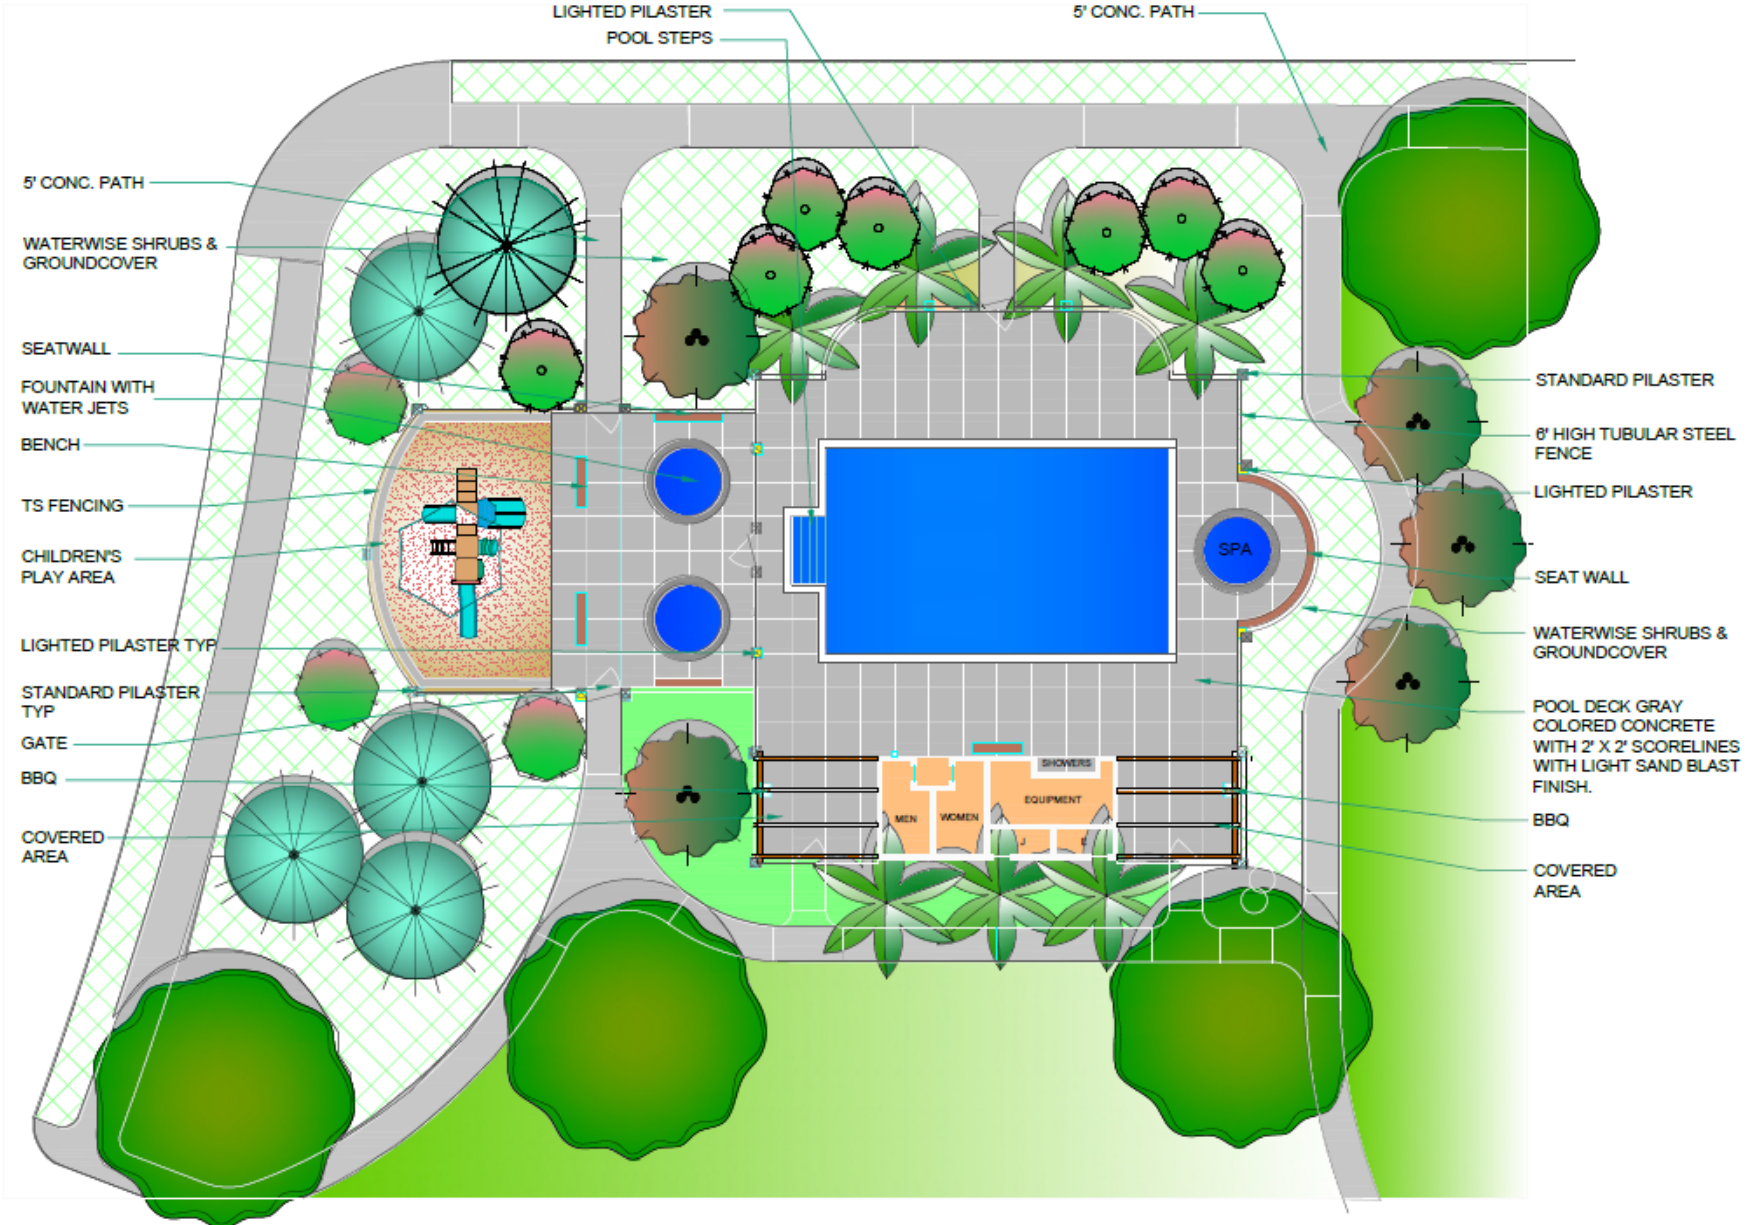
A CONCEPTUAL LANDSCAPE PLAN
